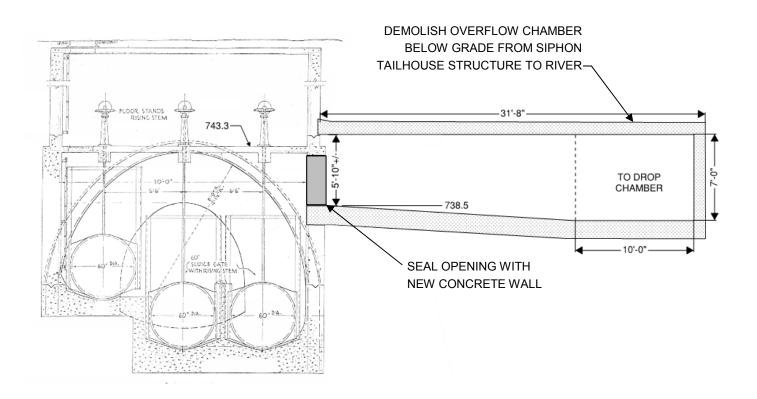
Siphon Tailhouse Chamber Section View II
